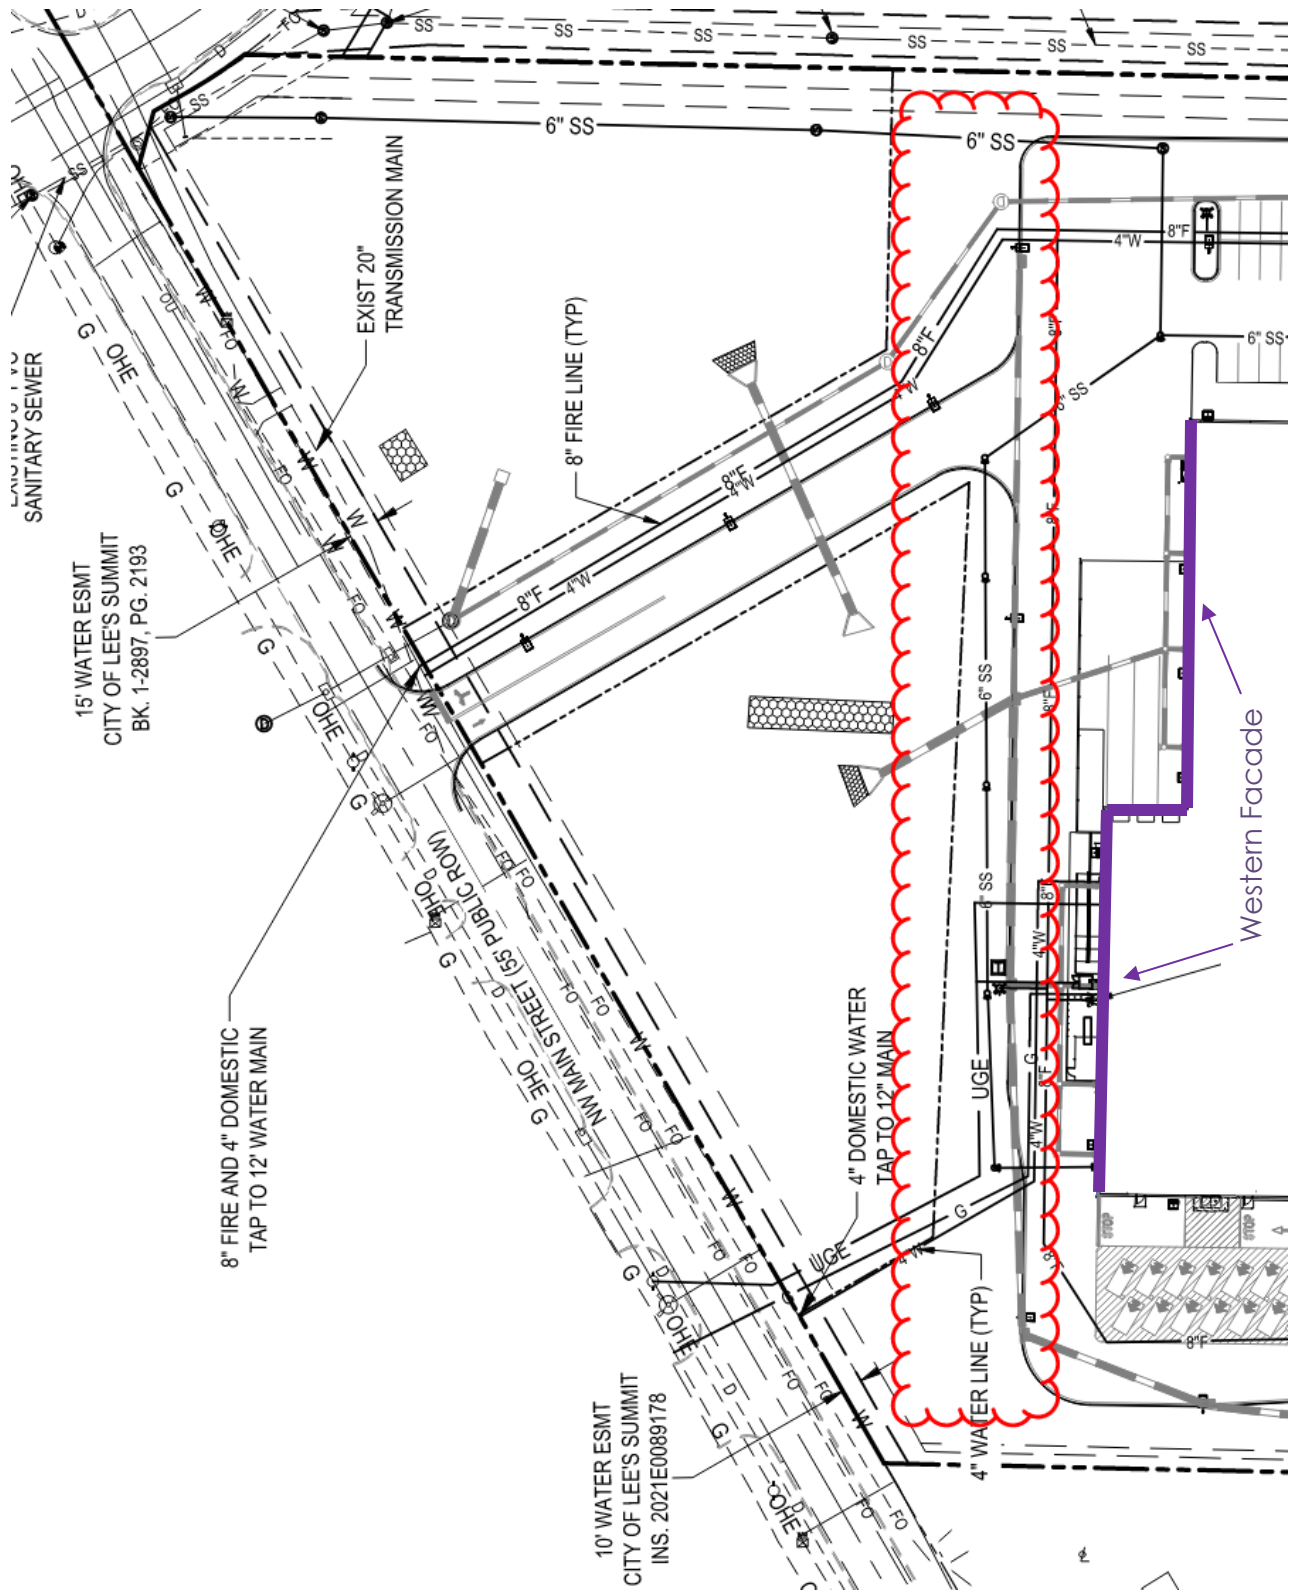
Proposed Utility Plan Showing the Location of the Proposed Landscape Screening (Circled in Red and Western Façade in Purple)
